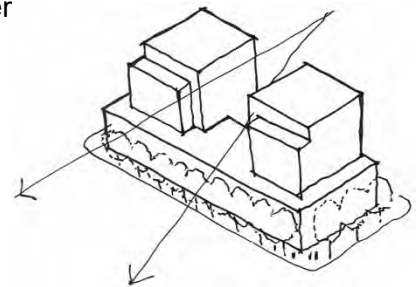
Slender building forms enhance daylight penetration and cooling through cross ventilation.
